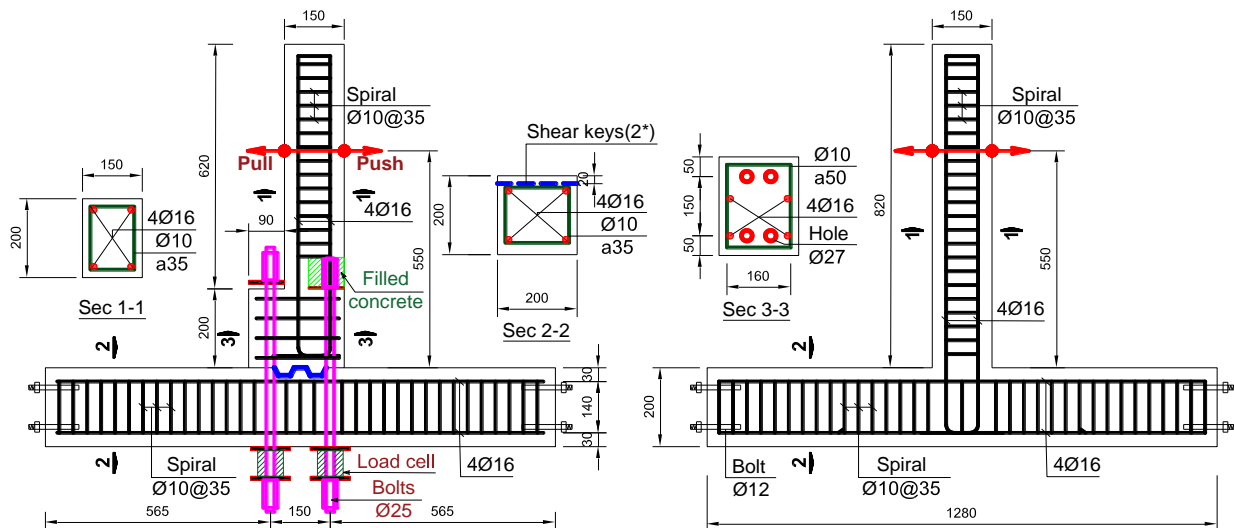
Designs of the hybrid joint (Left) and monolithic joint (Right) (unit: mm).
